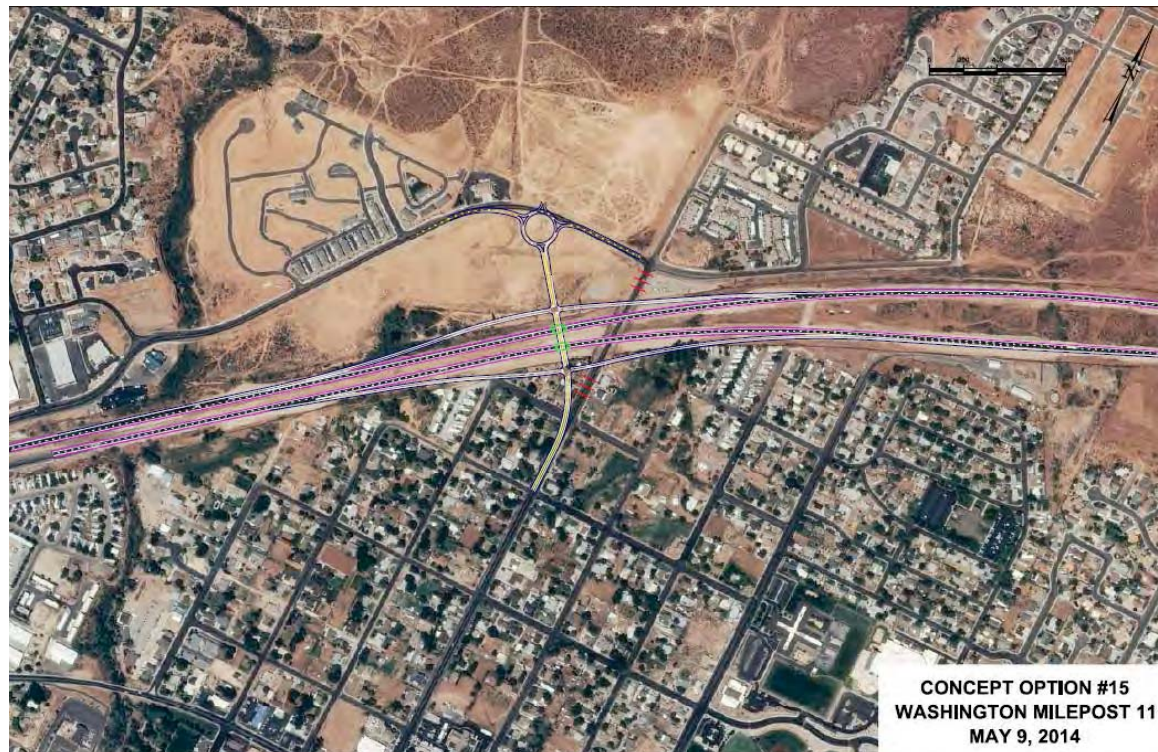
Main Street re-aligned with a roundabout intersection at Buena Vista Boulevard.
